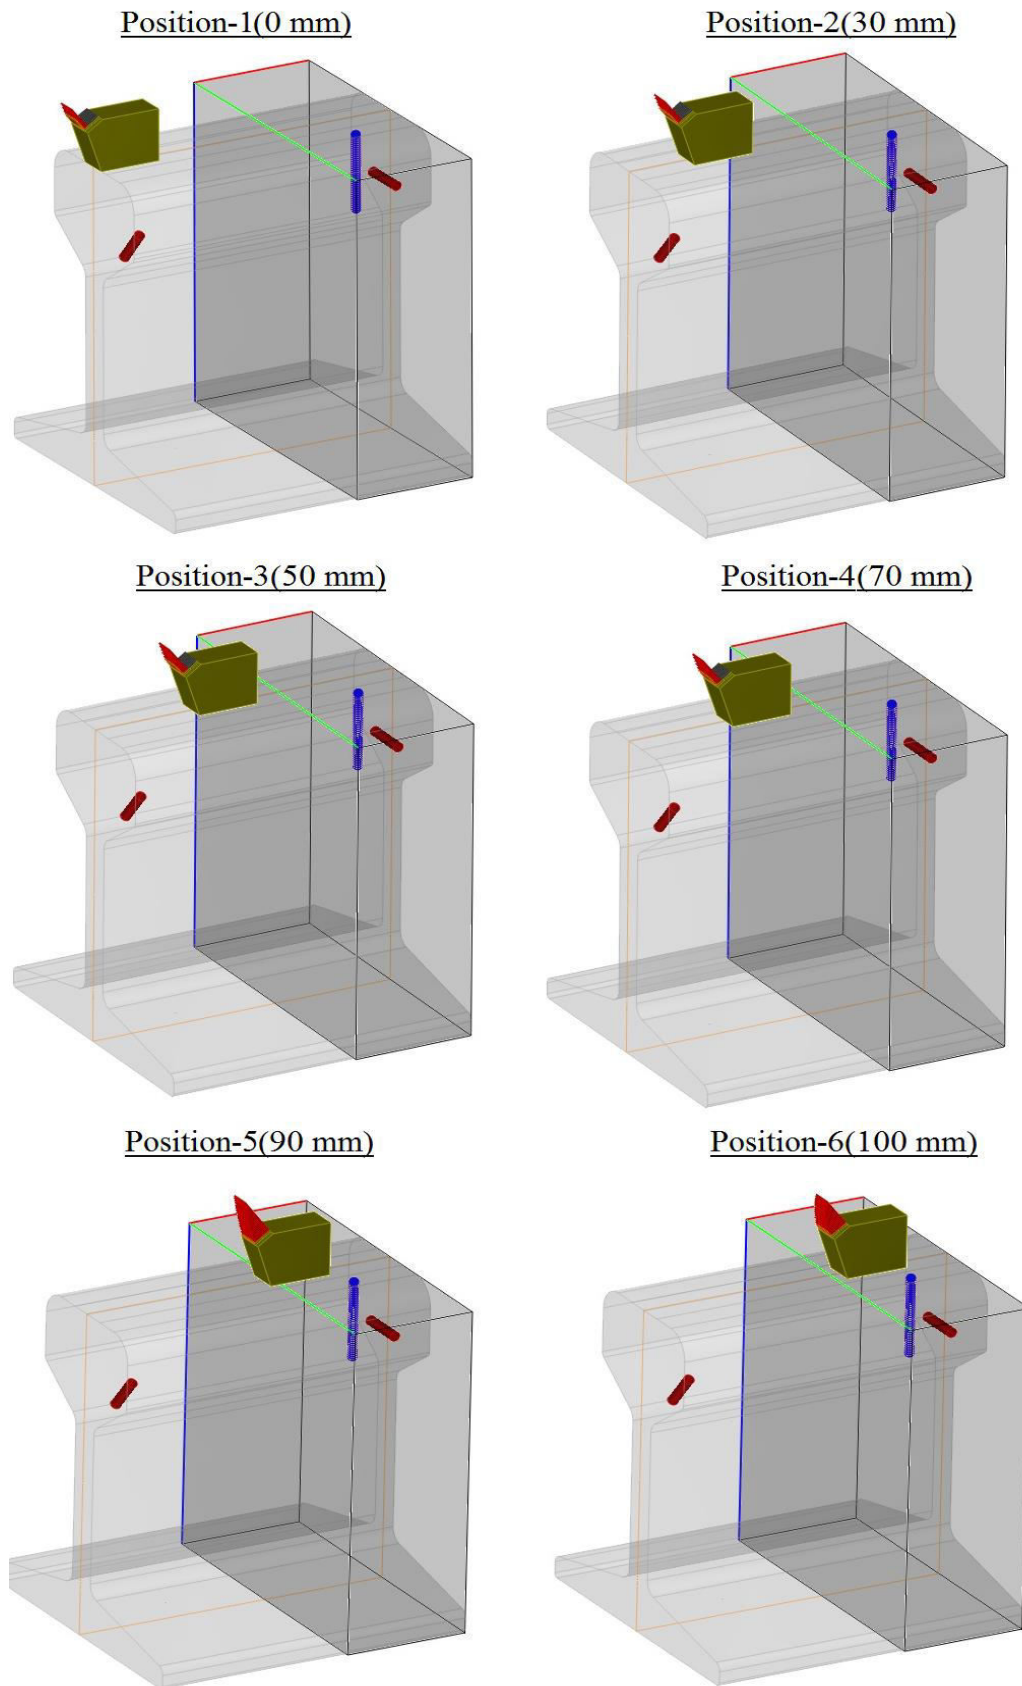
Various positions of PA1 used for inspecting defect-1
